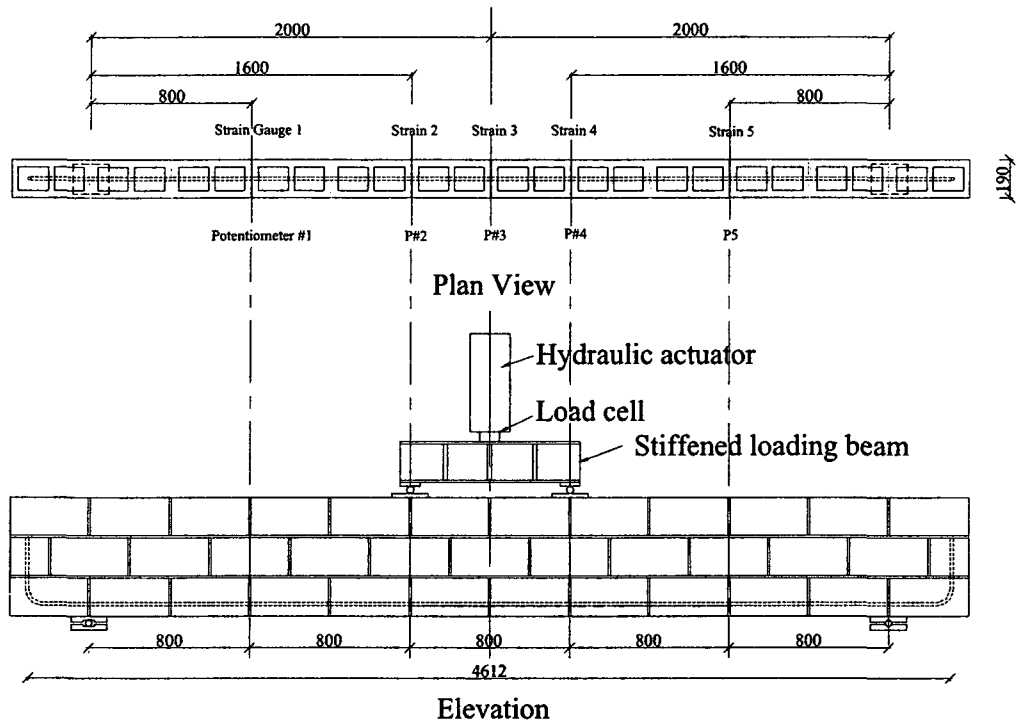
Elevation and plan view of three-course reinforced masonry specimens showing locations of strain gauges and potentiometers.
